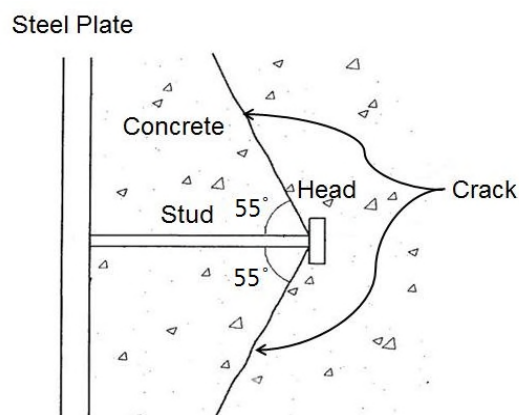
Localized concrete crack at the stud (ACI 2011)
